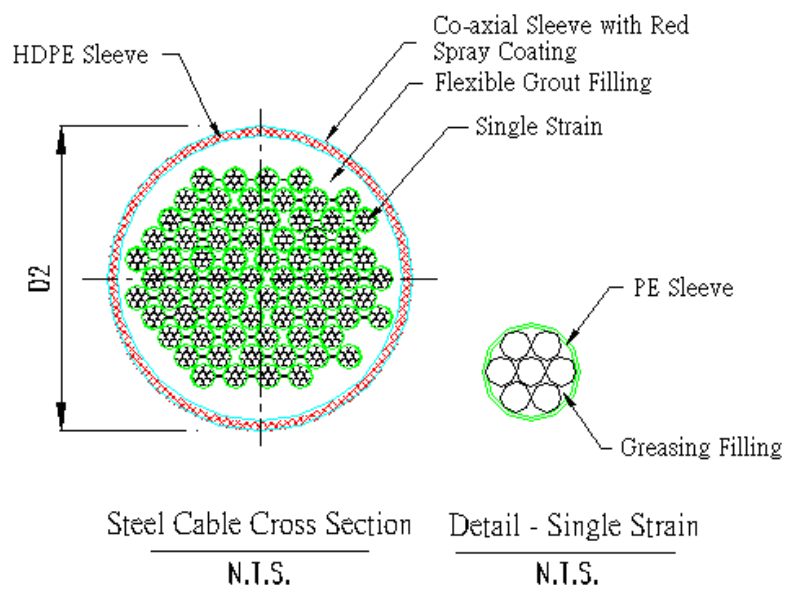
Cross Section of Stay Cable (Taiwan Area National Expressway Engineering Bureau, 2002)
